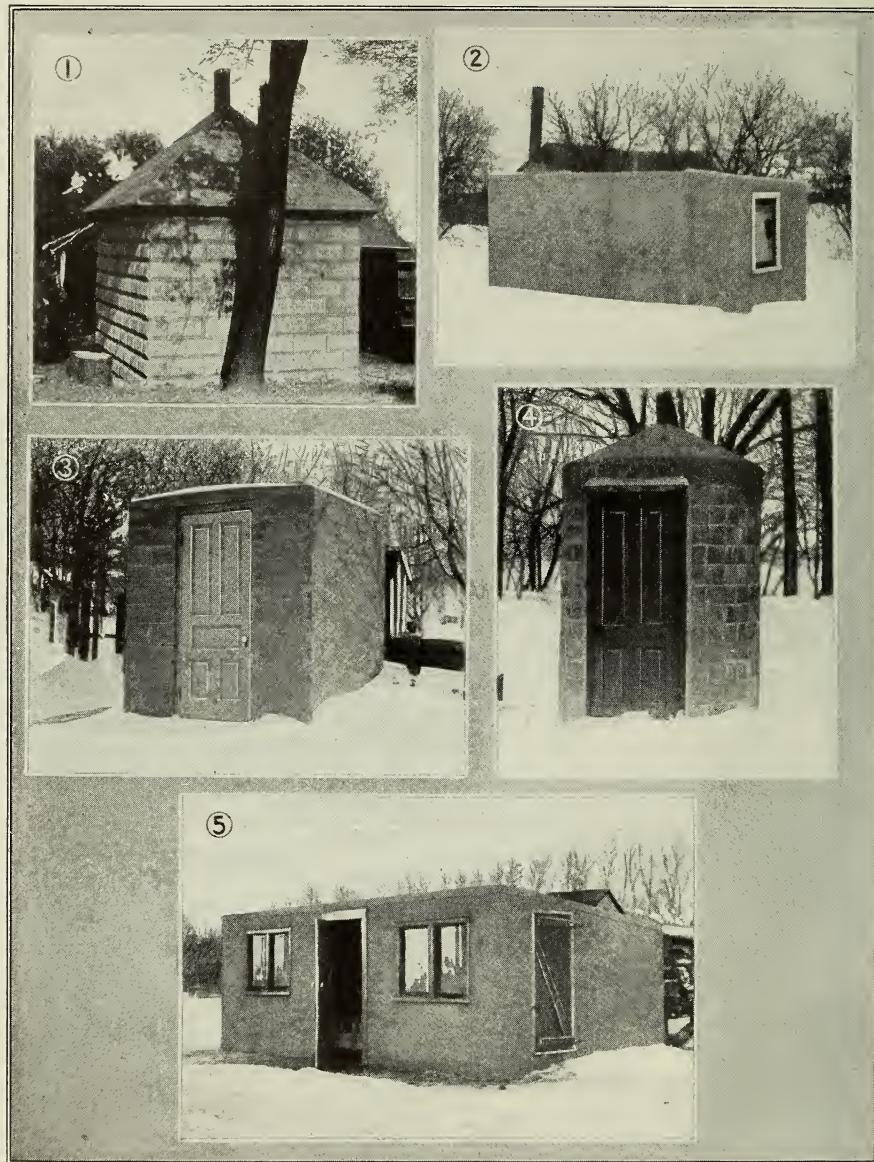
SMALL CONCRETE BUILDINGS ERECTED BY OWNERS
